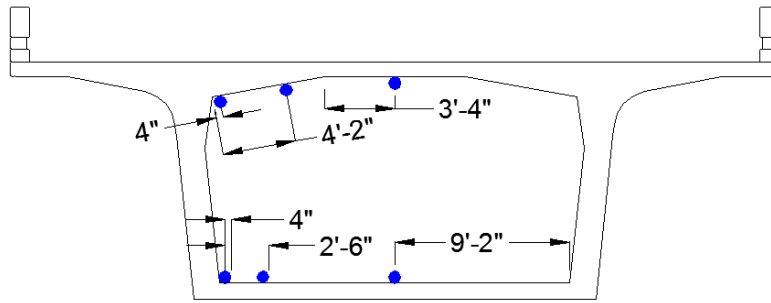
Smart Road Bridge Section A Longitudinal Strain Instrumentation – Looking in the Direction of Southbound Traffic
